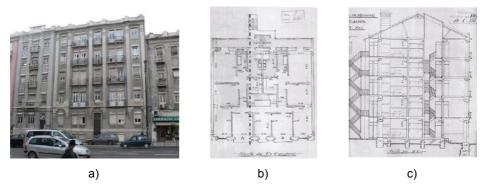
'Gaioleiro' building located at Almirante Reis Avenue (Jesus, 2007): a) Front façade wall; b) Plan of a current floor; c) Longitudinal cross section.
